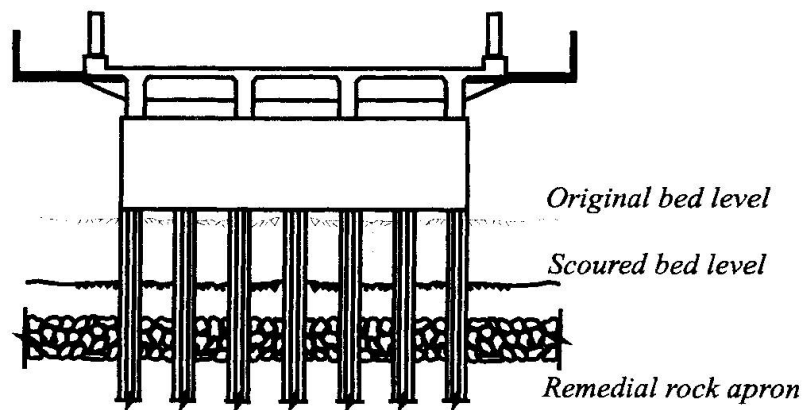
Typical Side Elevation of a Foundation and Remedial Works for the Ashburton River Road Bridge
